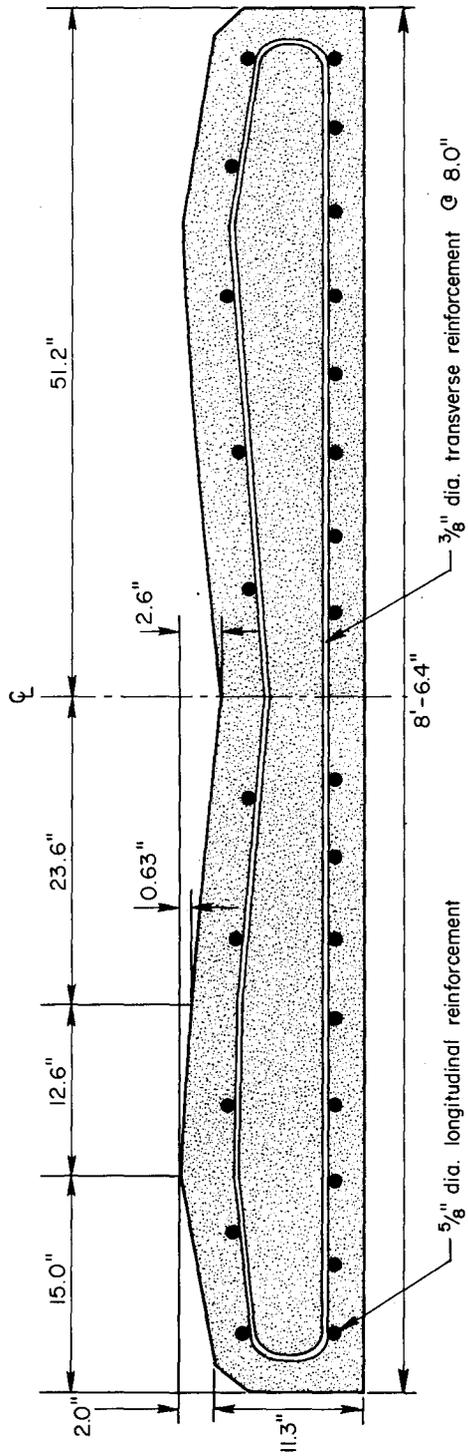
SLAB CROSS SECTION OF BRITISH RAILWAYS TRACK
